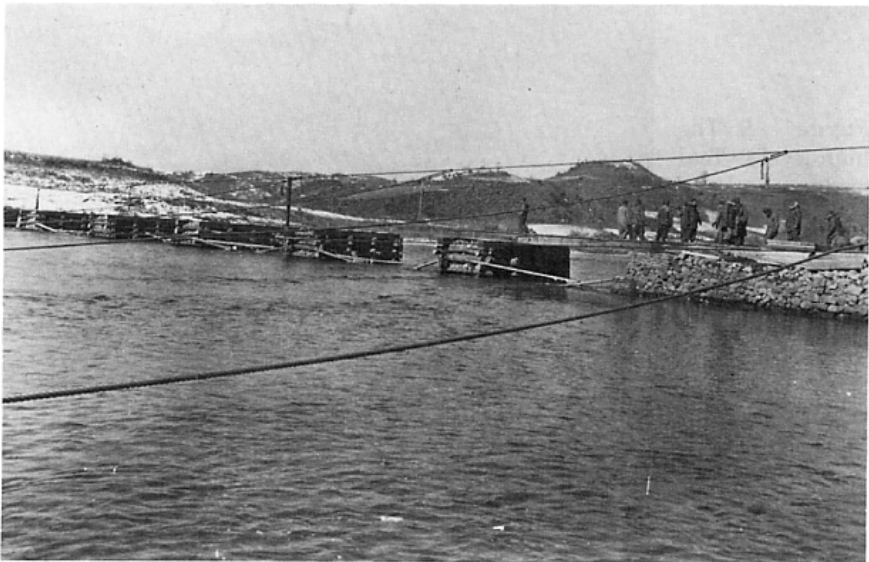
The low-level pile bridge at the Freedom Gate site that the 84th Engineer Construction Battalion erected in January–February 1952 between two destroyed railway spans. The shadow cast by the more southerly of the railway bridges, which the 84th would reopen in July 1952, is visible at the right of this 10 March 1952 photo.
